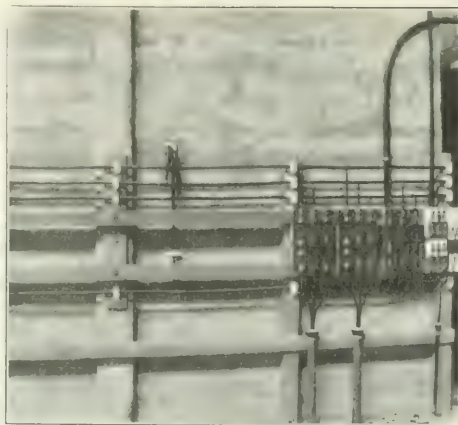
TYPICAL DISTRIBUTION RACK ON EXTERIOR WALL OF TRANSFORMER VAULT
